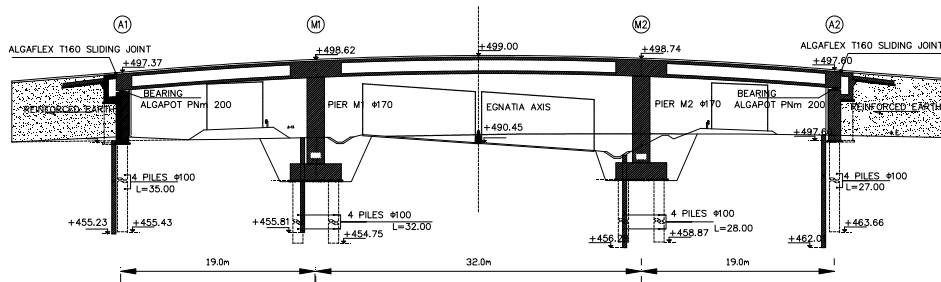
Elevation view of the selected overpass bridge (Pedini bridge)
